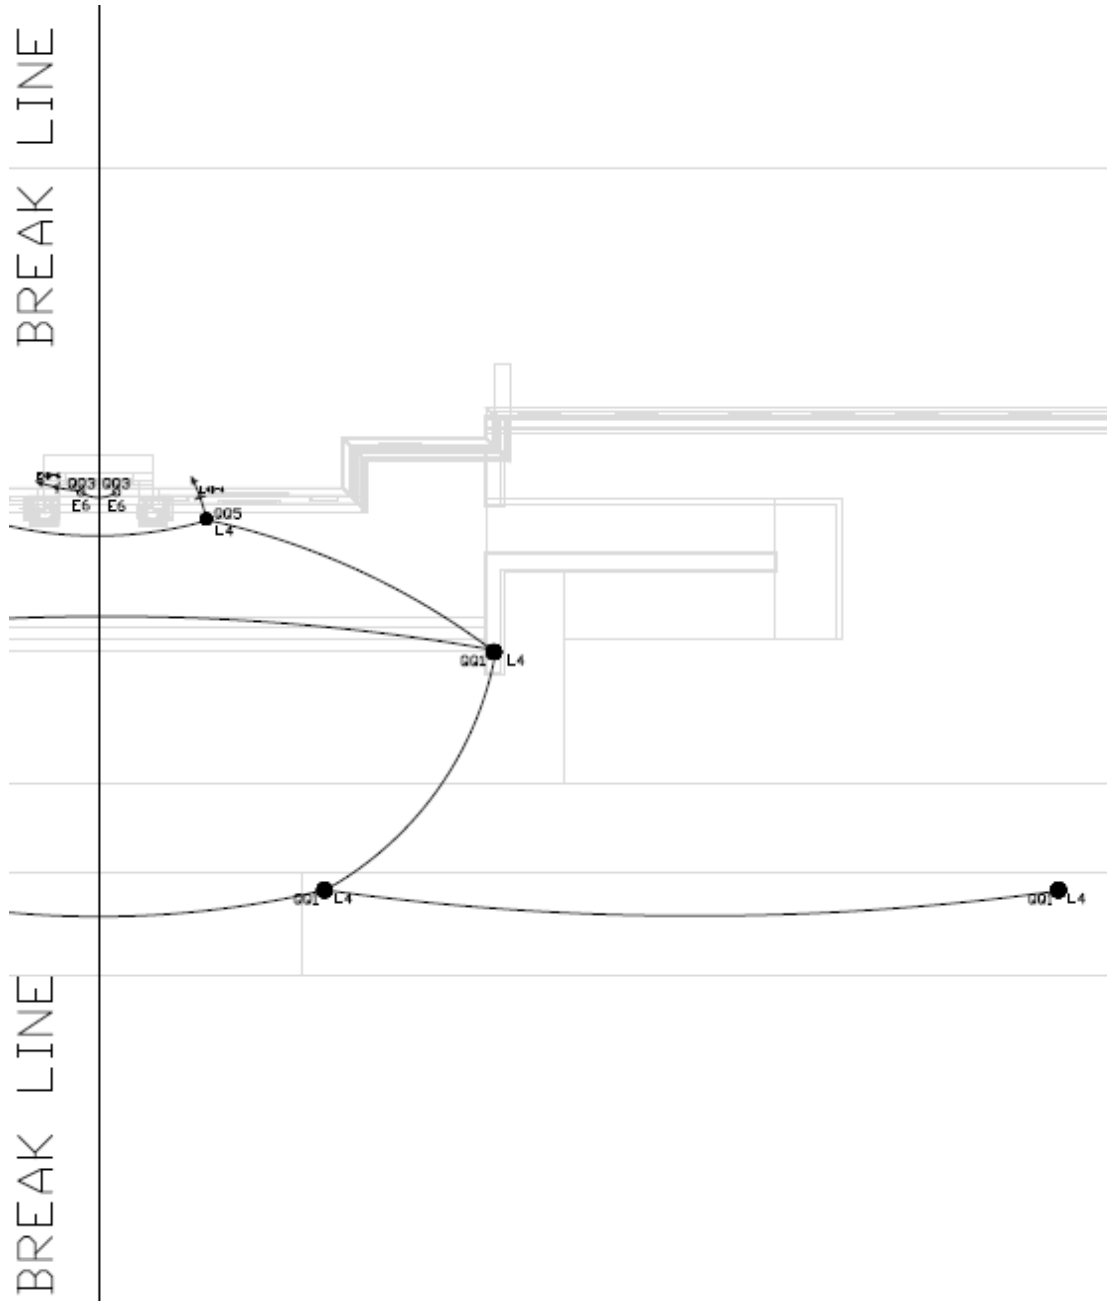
First Floor Circuiting Plan for East Entry and Façade – North Of Entrance
